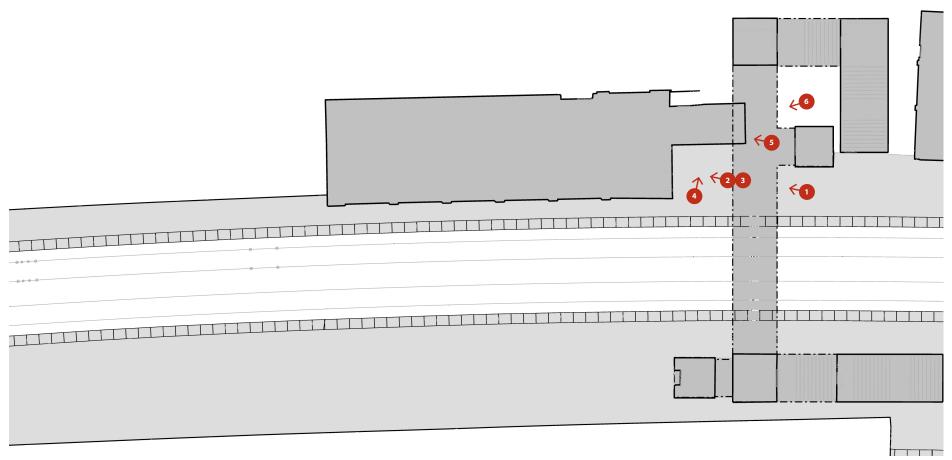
Key plan showing location and direction of photos of the exterior north elevation of Goods Shed
